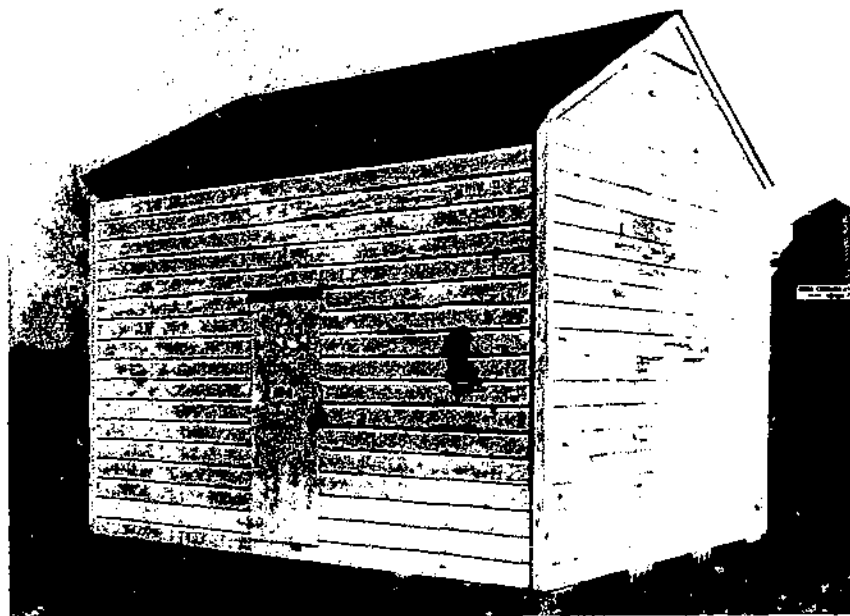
Wood bin used in wheat studies at Hutchinson, showing the arrangement of the concrete foundation blocks. The wires at the corners anchored bin to buried logs. Peeling paint was caused by green wood used in construction. The filling door in gable did not exclude water.
